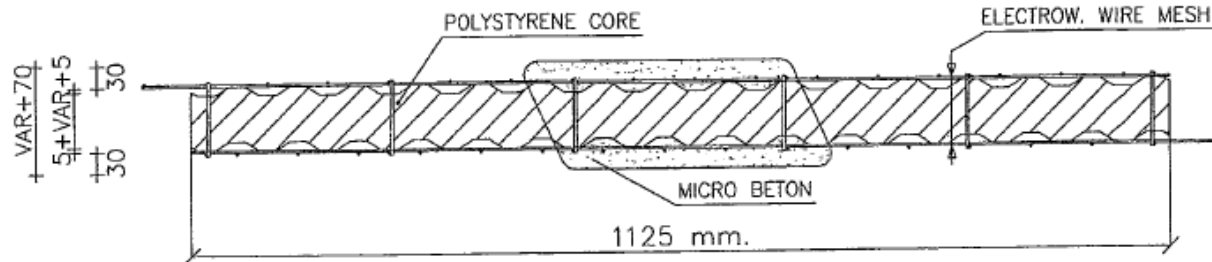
Emmedue Single Panel PSM80 Details (Ref. 1, p.7)
